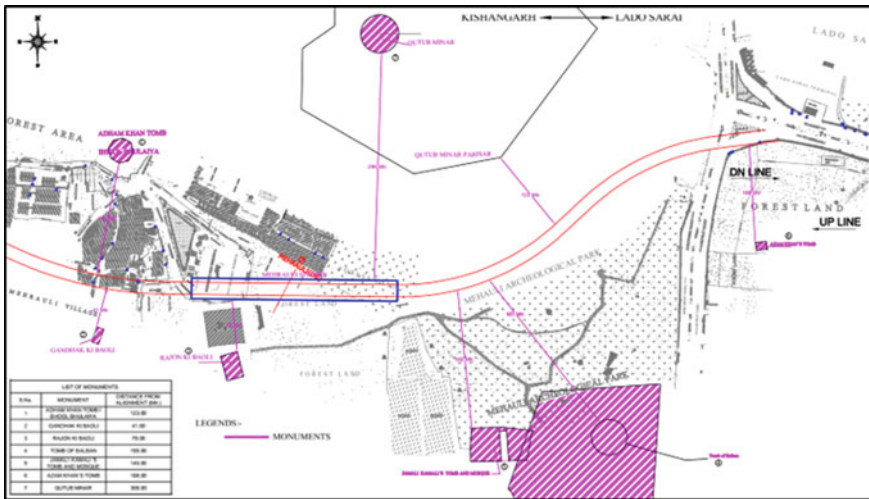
Layout of the proposed metro line alignment and location of Heritage monuments
